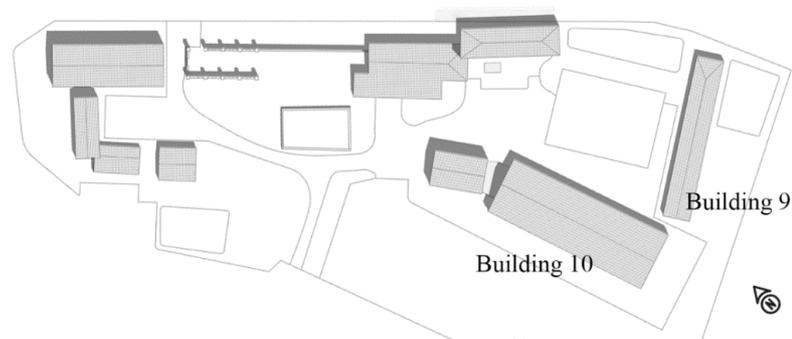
Masterplan of Cascina Nosedo and indication of the buildings analysed (B9 and B10)
